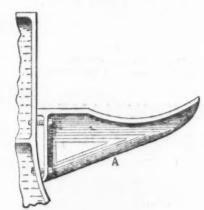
Form of Bracket for Supporting Large Exhaust-Tubes.
